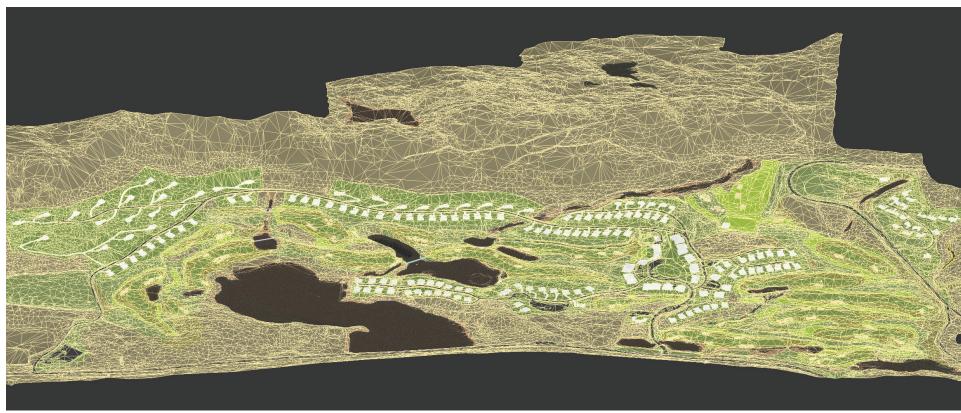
Sample Aerial - 3D wire frame of the Proposed Site Plan Phase I
